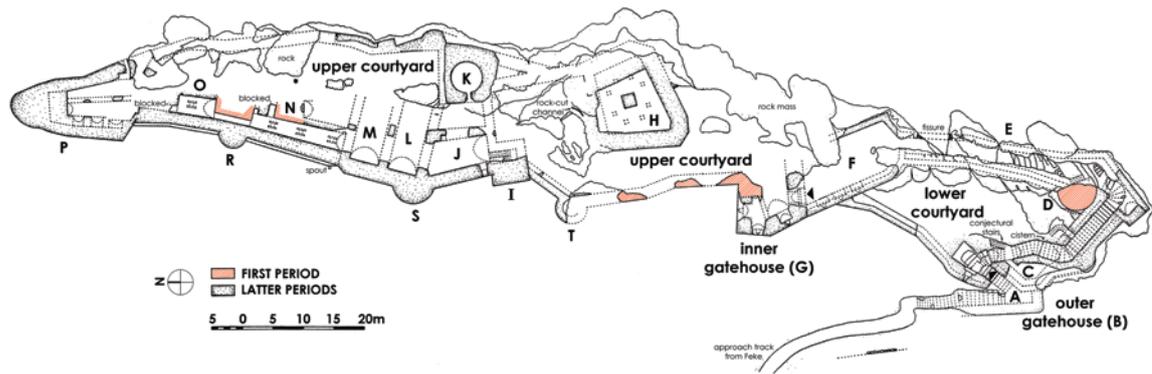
Ground floor plan of the castle (Base map source: Dunbar & Boal, 1964)
